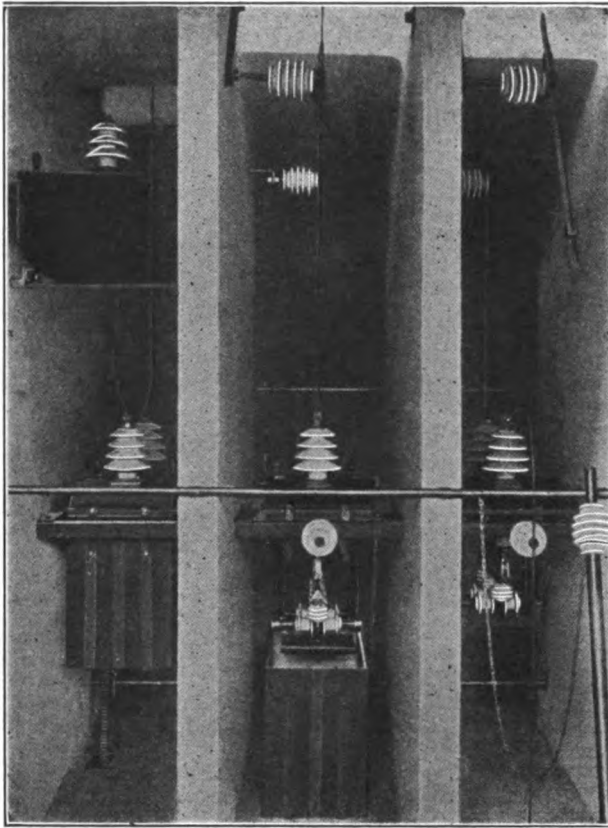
CONCRETE SWITCH STRUCTURE—40,000 VOLTS
